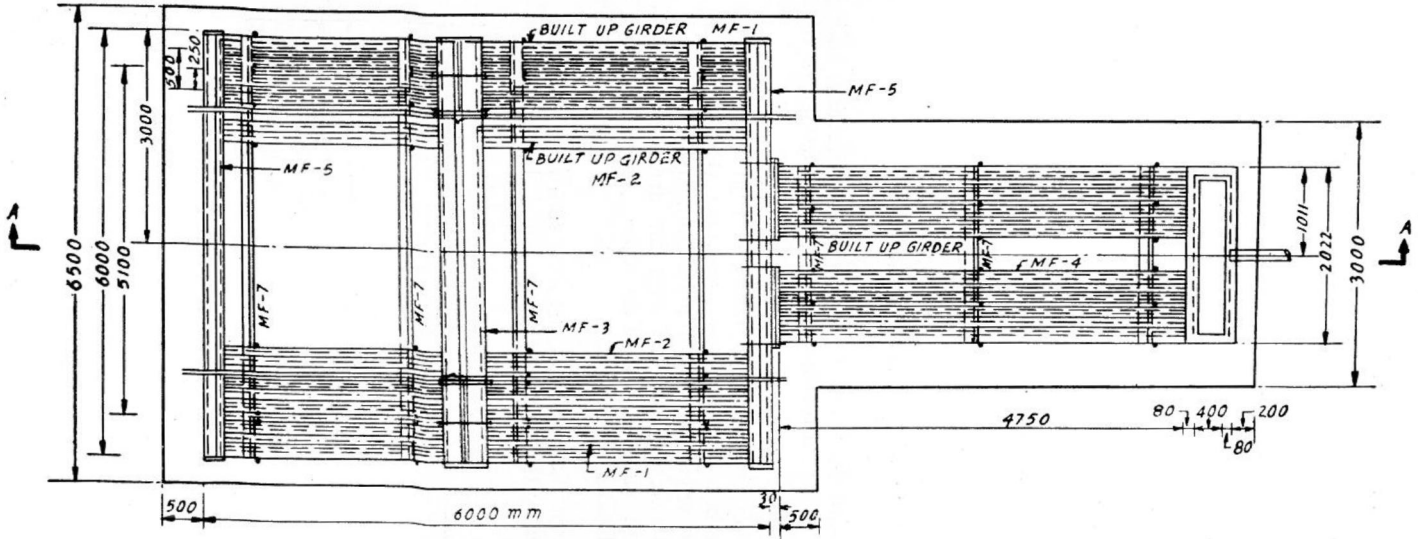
PLAN OF THE FOUNDATION BLOCK
